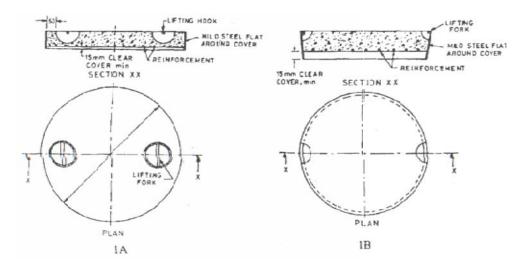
Typical Illustration of Circular Precast Concrete Manhole Cover All dimensions in millimeters
